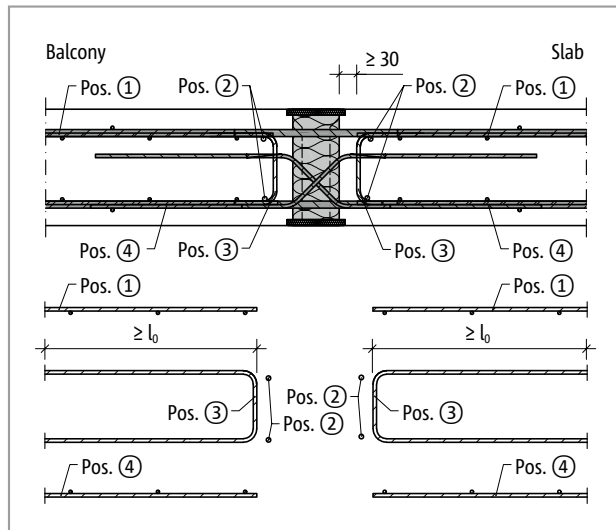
Schöck Isokorb® T type D: On-site reinforcement
